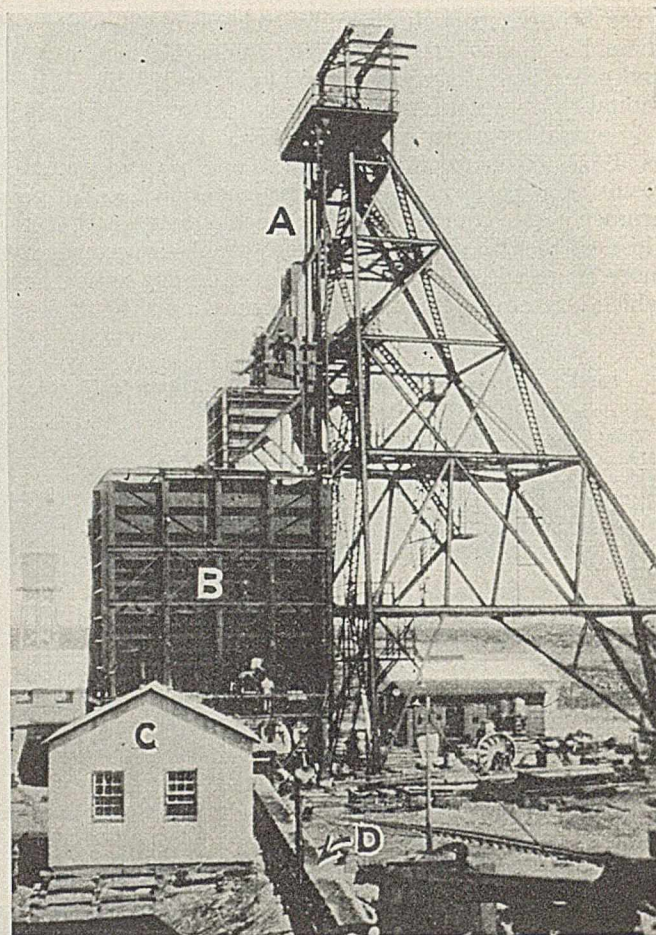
Mine of the U. S. Potash Co. (A) Hoist and head frame; (B) 400-ton storage bin; (C) dry house; (D) conveyor to crushing plant
